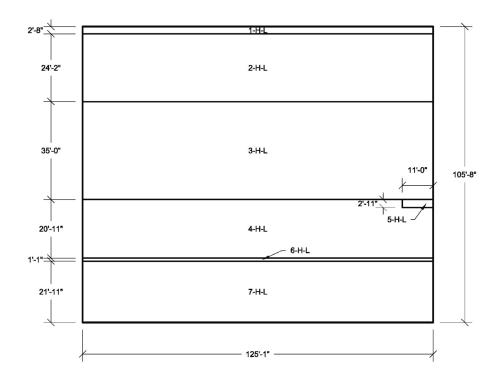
H.3-25 West Wall Looking East Horizontal Reinforcement Zones Far Side Face
